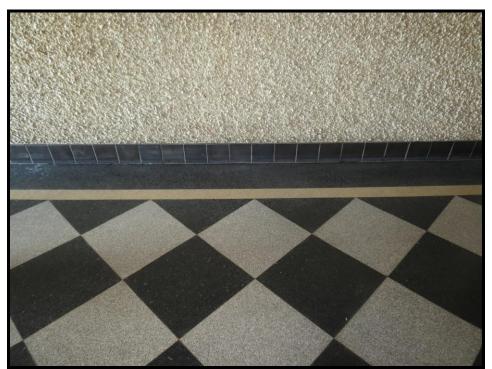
Detail of Floor in Lobby of 1014 King Street West, Hamilton –
